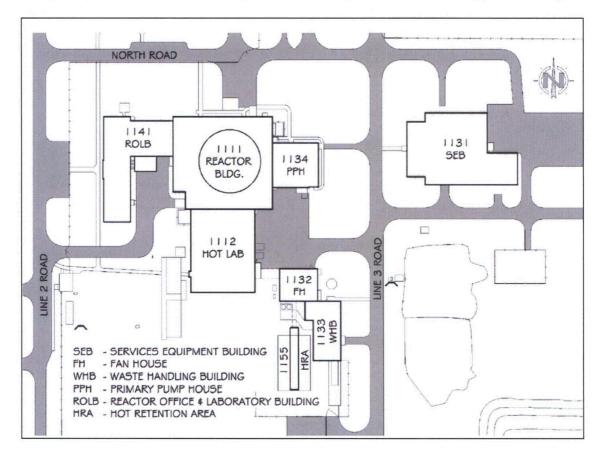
, PBRF NW Area Showing Reactor Building, WHB and Other Support Buildings
